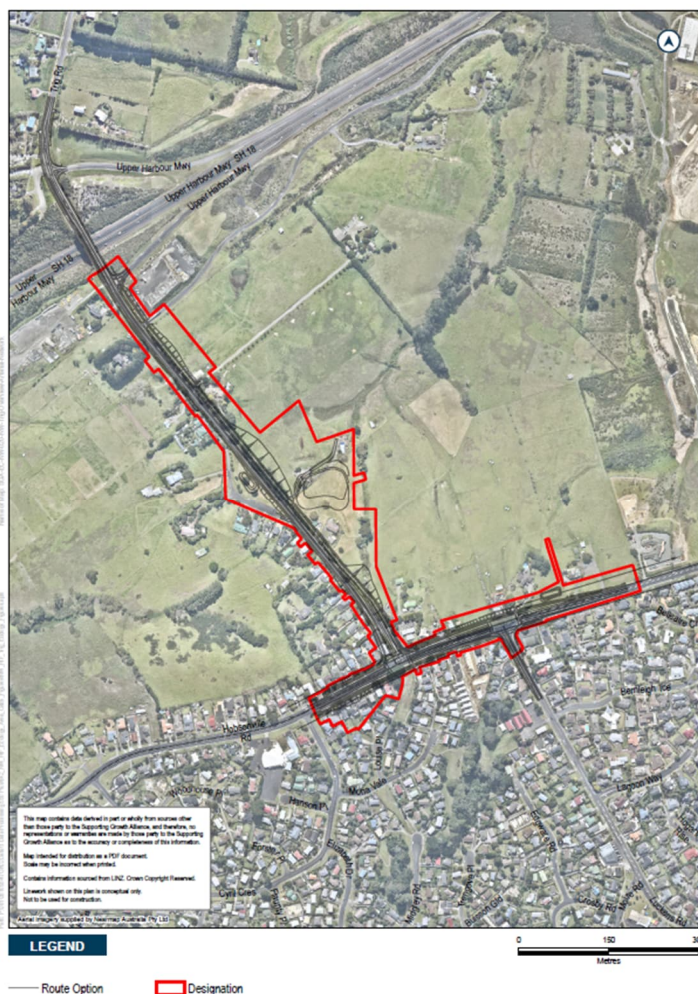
Whenuapai – Trig Road Corridor Upgrade
